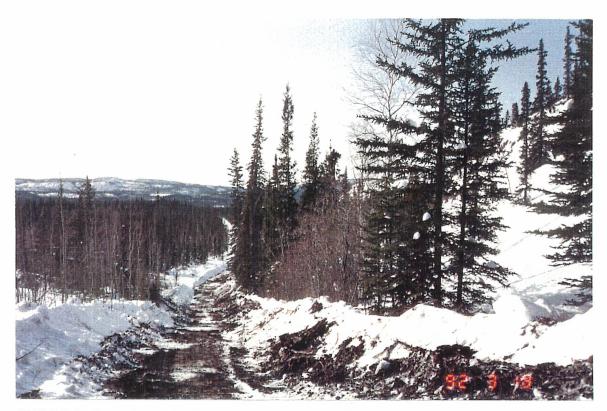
View looking south from summit near station 4 + 100. (Neg # 6A)
